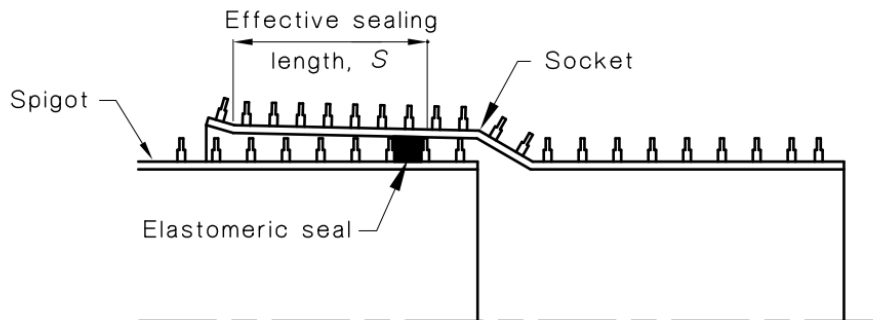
TYPICAL ELASTOMERIC SEAL JOINT ON RIBBED AND PROFILE WALL PIPES AND FITTINGS
